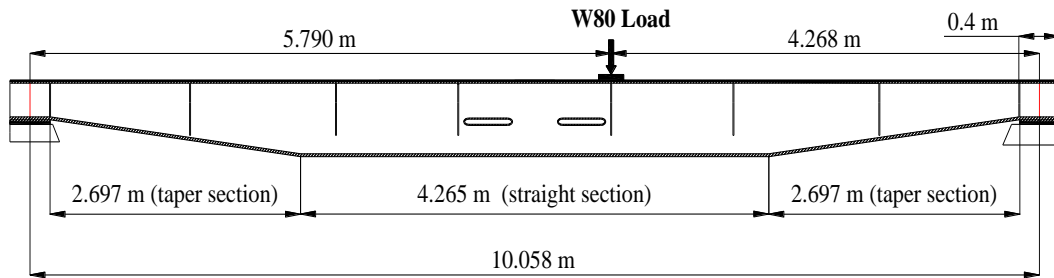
W80 load applied to main box girder in the laboratory testing
